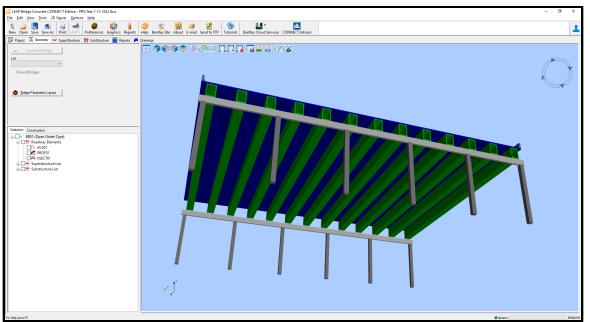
Structural Concrete Model Rendering, Close up of Underside
